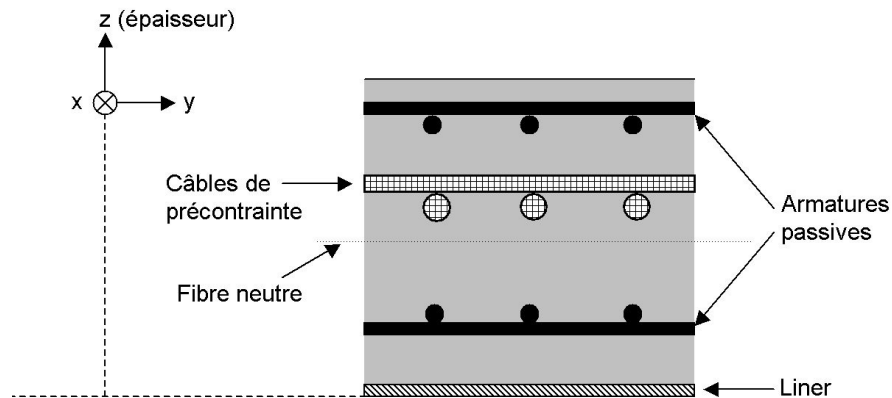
a : 3-a Current section of the reinforced concrete shell.
